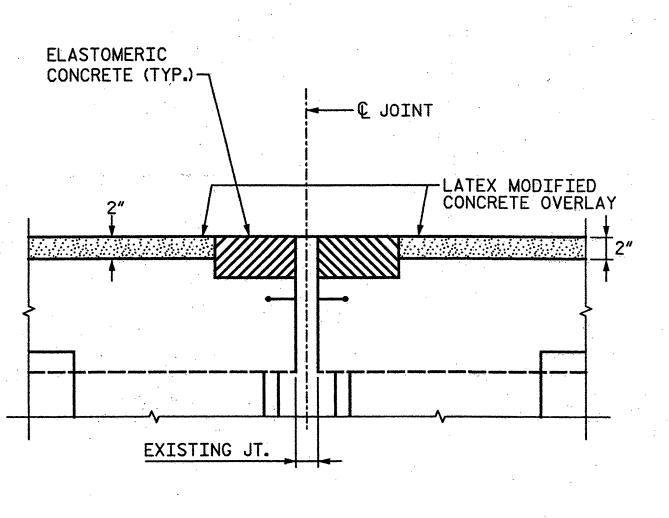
DETAIL OF EXPANSION JOINT BETWEEN APPROACH SLAB AND CURVED END BLOCK
